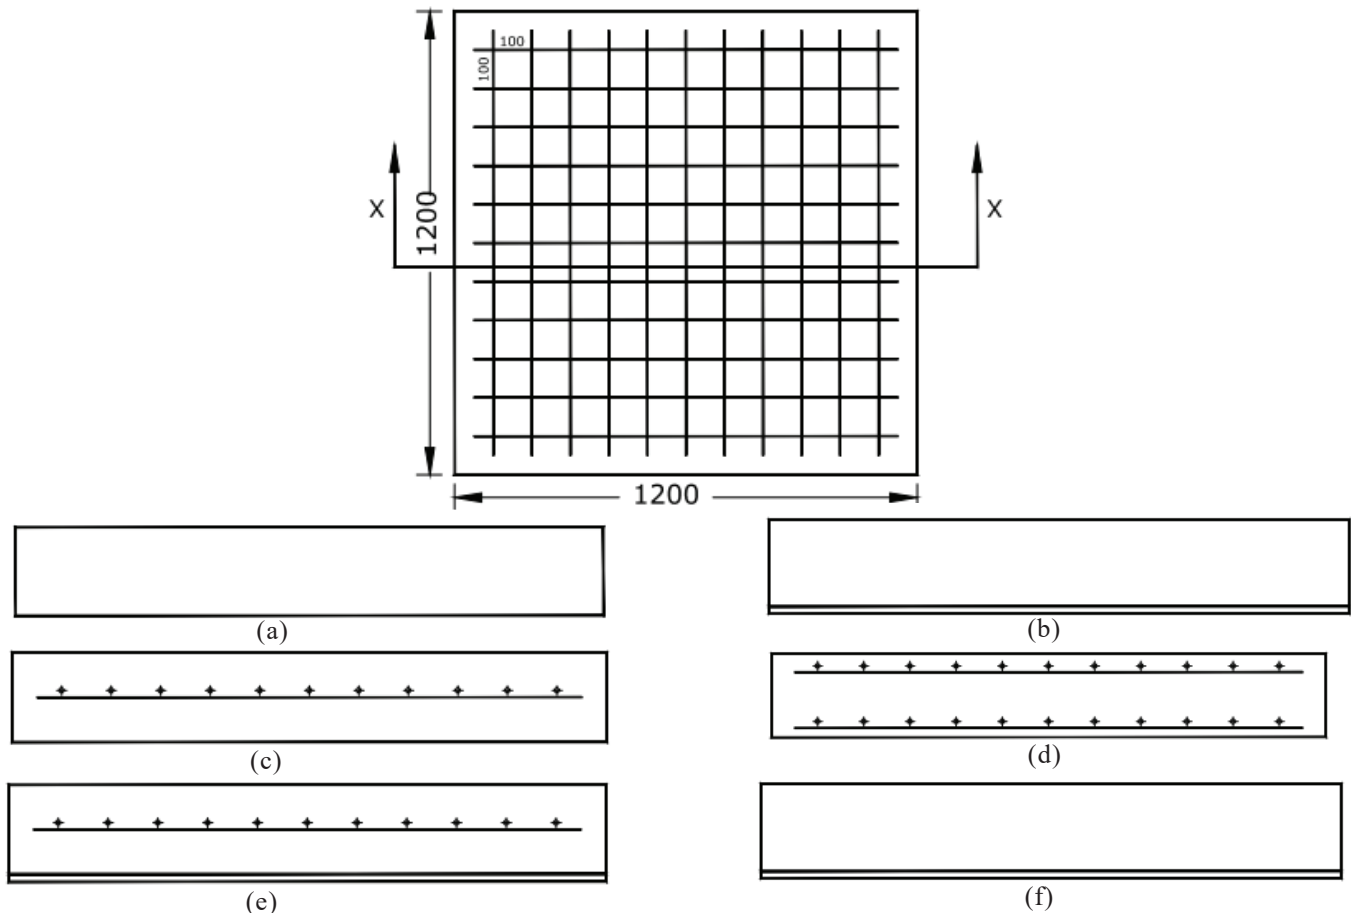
Reinforced concrete targets (a) Plain concrete; (b) Plain concrete Liner-2.25; (c) Single mat RC; (d) Double mat RC; (e) Single mat RC- Liner; and (f) Plain concrete liner-4.5.
